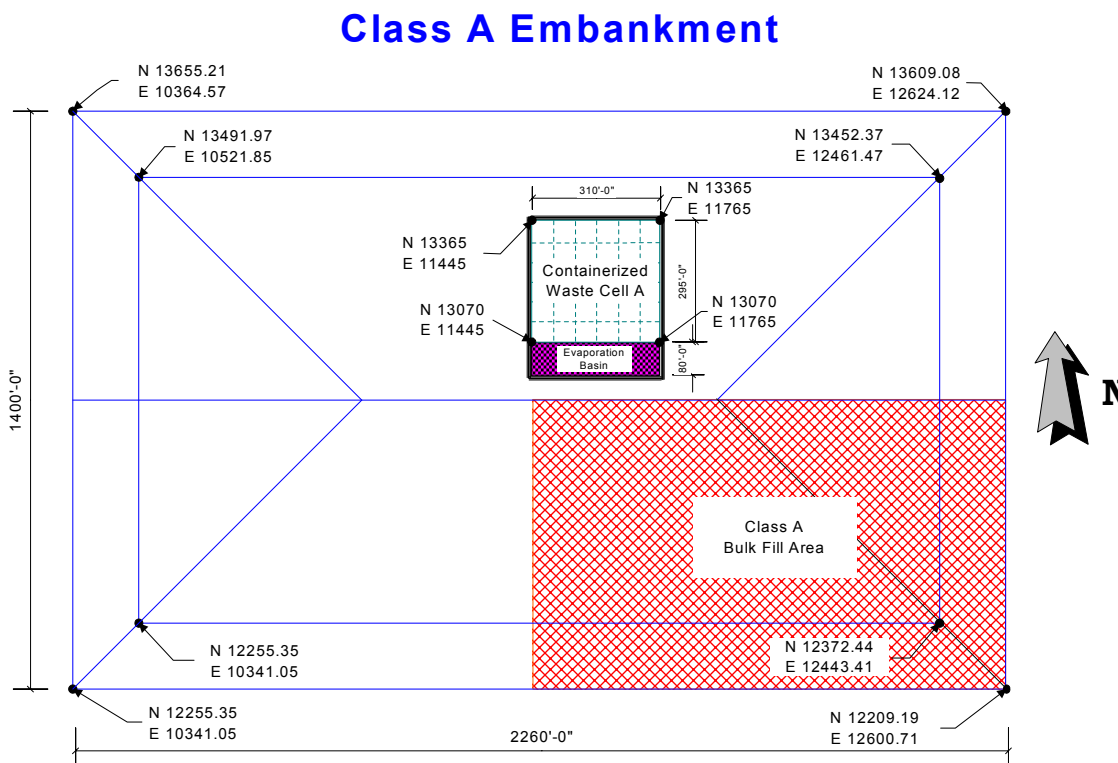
Containerized Waste Facility footprint within the Class A disposal embankment.
